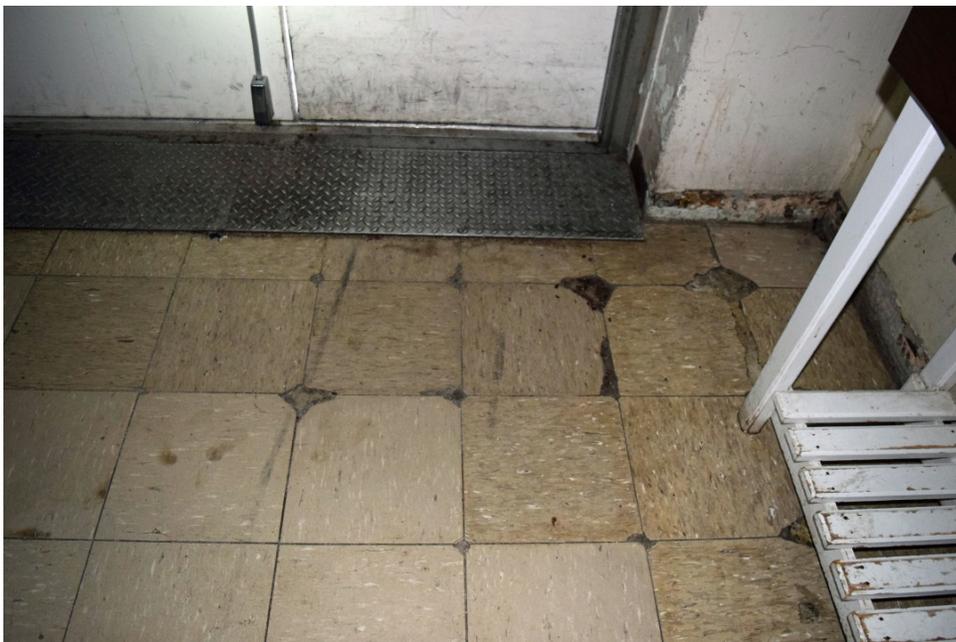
Cracking of concrete and tile at junction of CP-1 and CP-1A visible in basement entrance, Room 115A. Also present is baseboard damage from minor flooding through doorway and heavy use wear. Note at least two earlier generations of tile replacements from older damage. Light is also visible through door, indicating a route of insect and possibly mouse access (2016).
